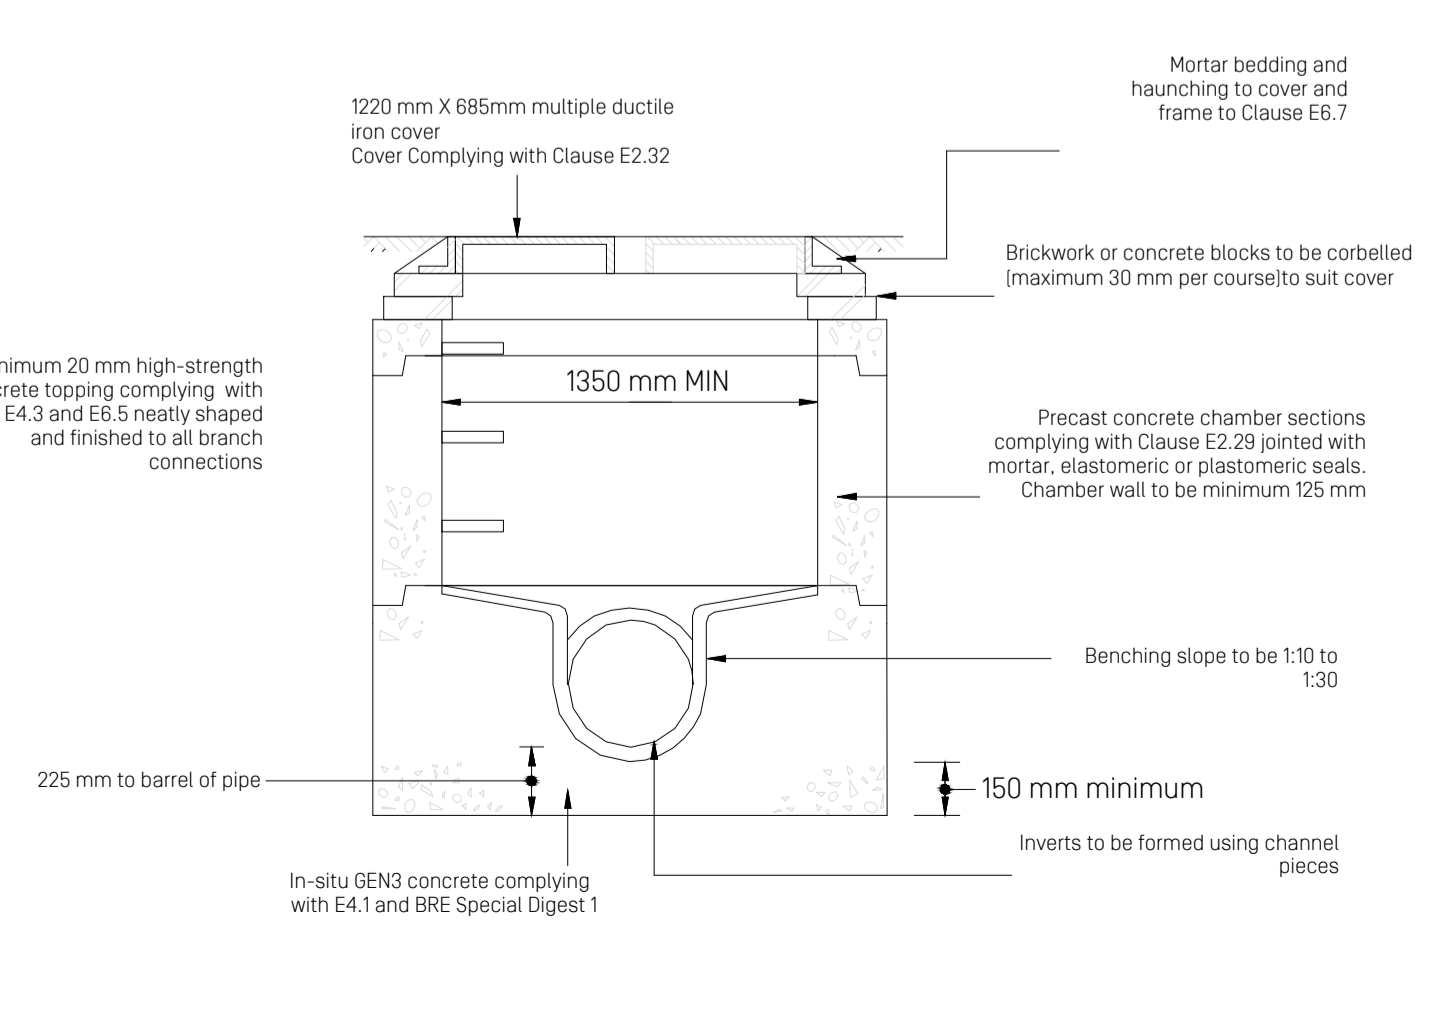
TYPICAL MANHOLE DETAIL - TYPE C
